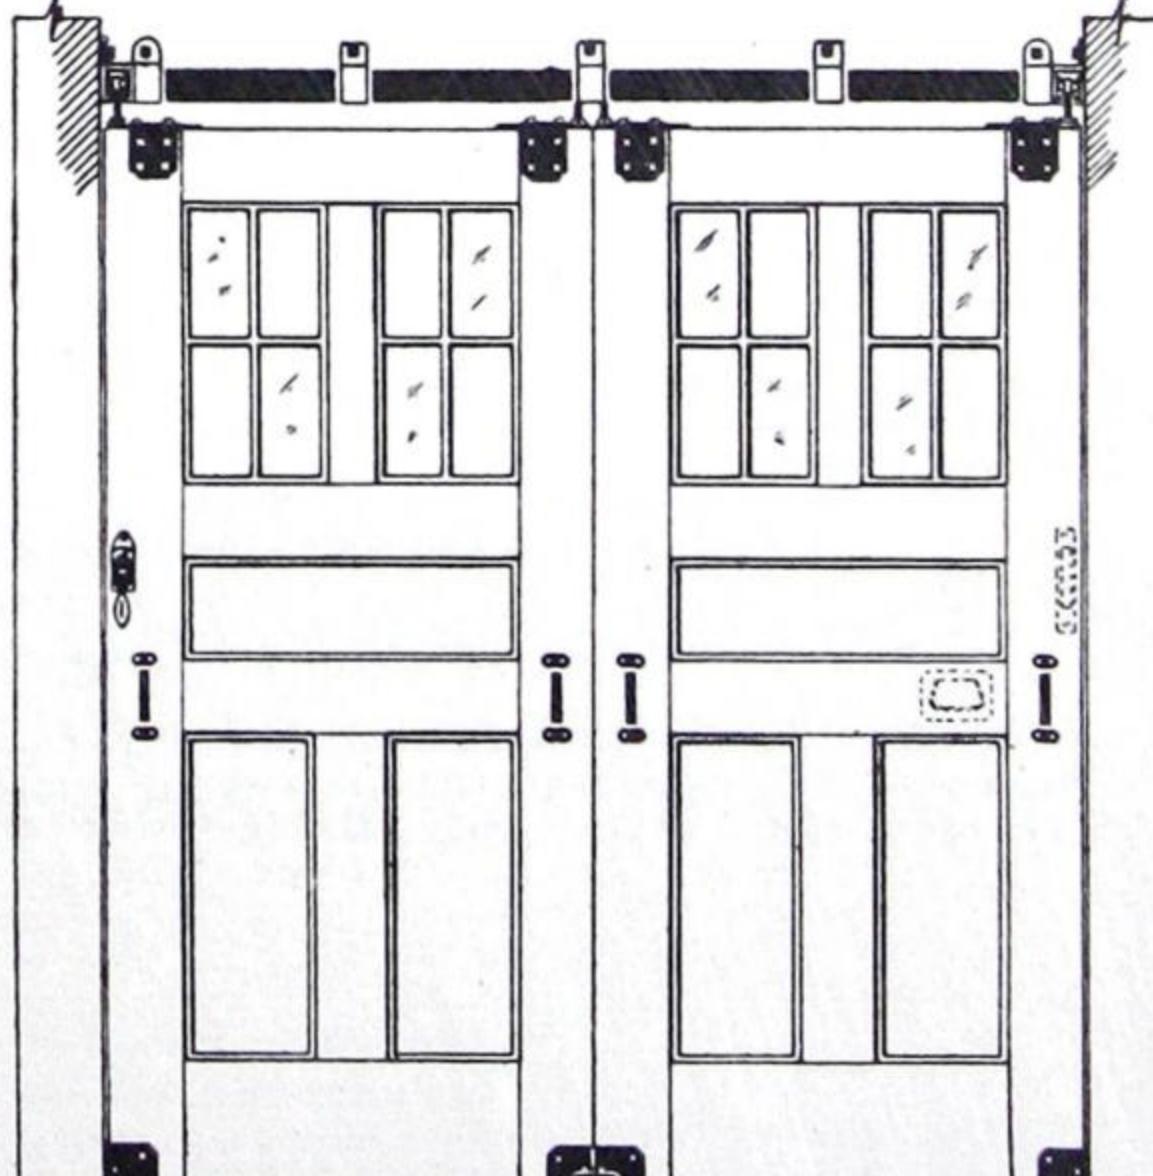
Interior elevation showing Set DD-6, including one 516 Door Bolt and one 825 Door Lock.
